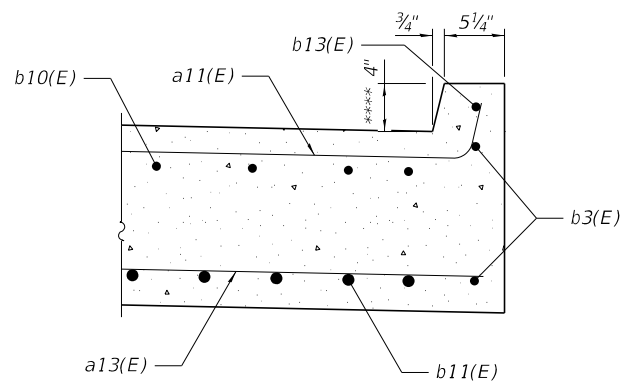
(Detail A shown, applies to Highway Standard 420401 only. Detail A for pavement connector (HMA) may be found on Highway Standard 420406.)
